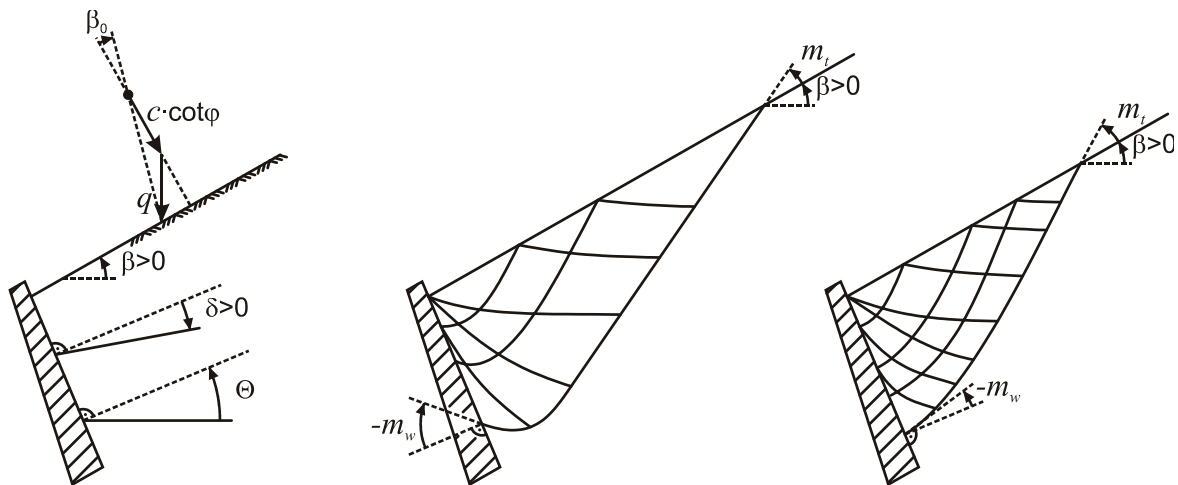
Definitions concerning wall and backfill inclination, surcharges and slipline geometry
